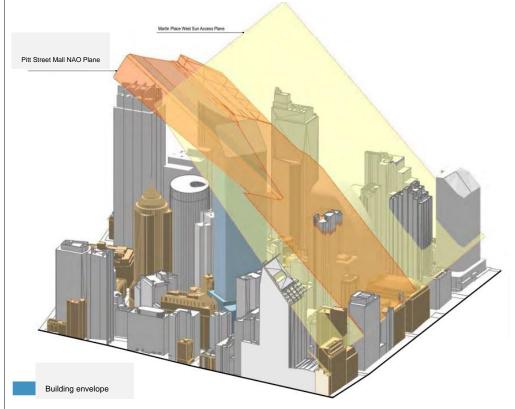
Western Site Solar Access Modelling (Urban Design Report) showing Pitt Street Mall No Additional Overshadowing Plane and Martin Place Sun Access Plane as defined by Sydney LEP 2012
